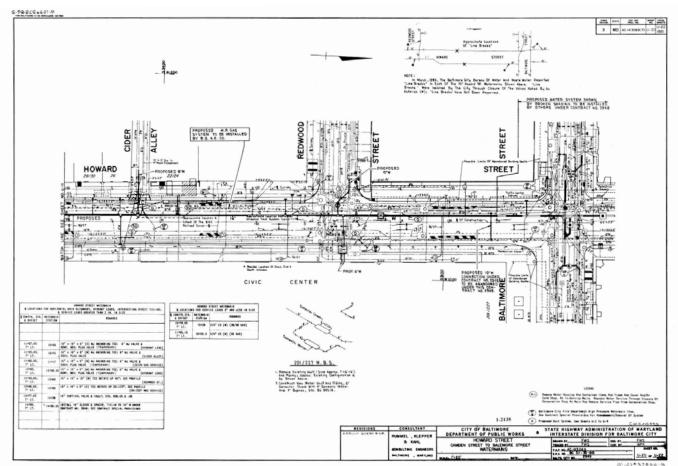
As-built plan view of leak area under Howard Street showing congestion of utilities
